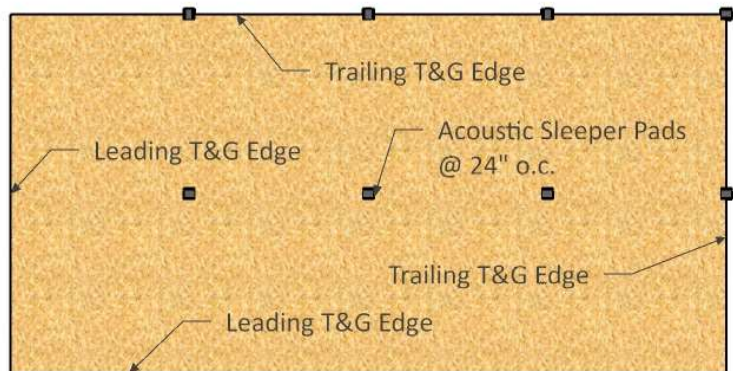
Typical Inverted Plan for Concrete, 4-sided T&G
